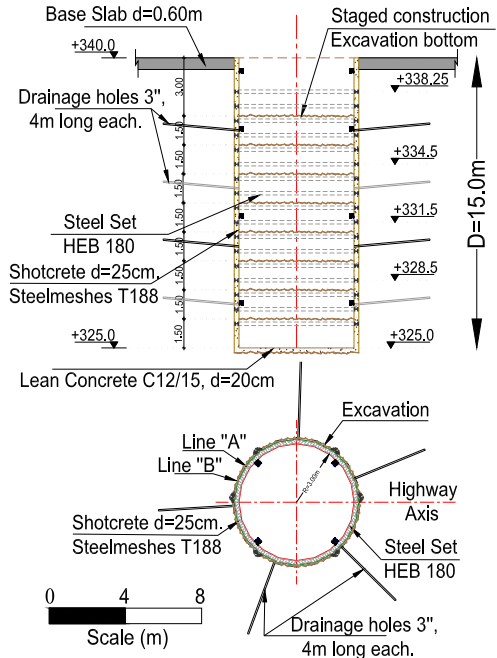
Typical cross-sections of caisson – Temporary support measures.
